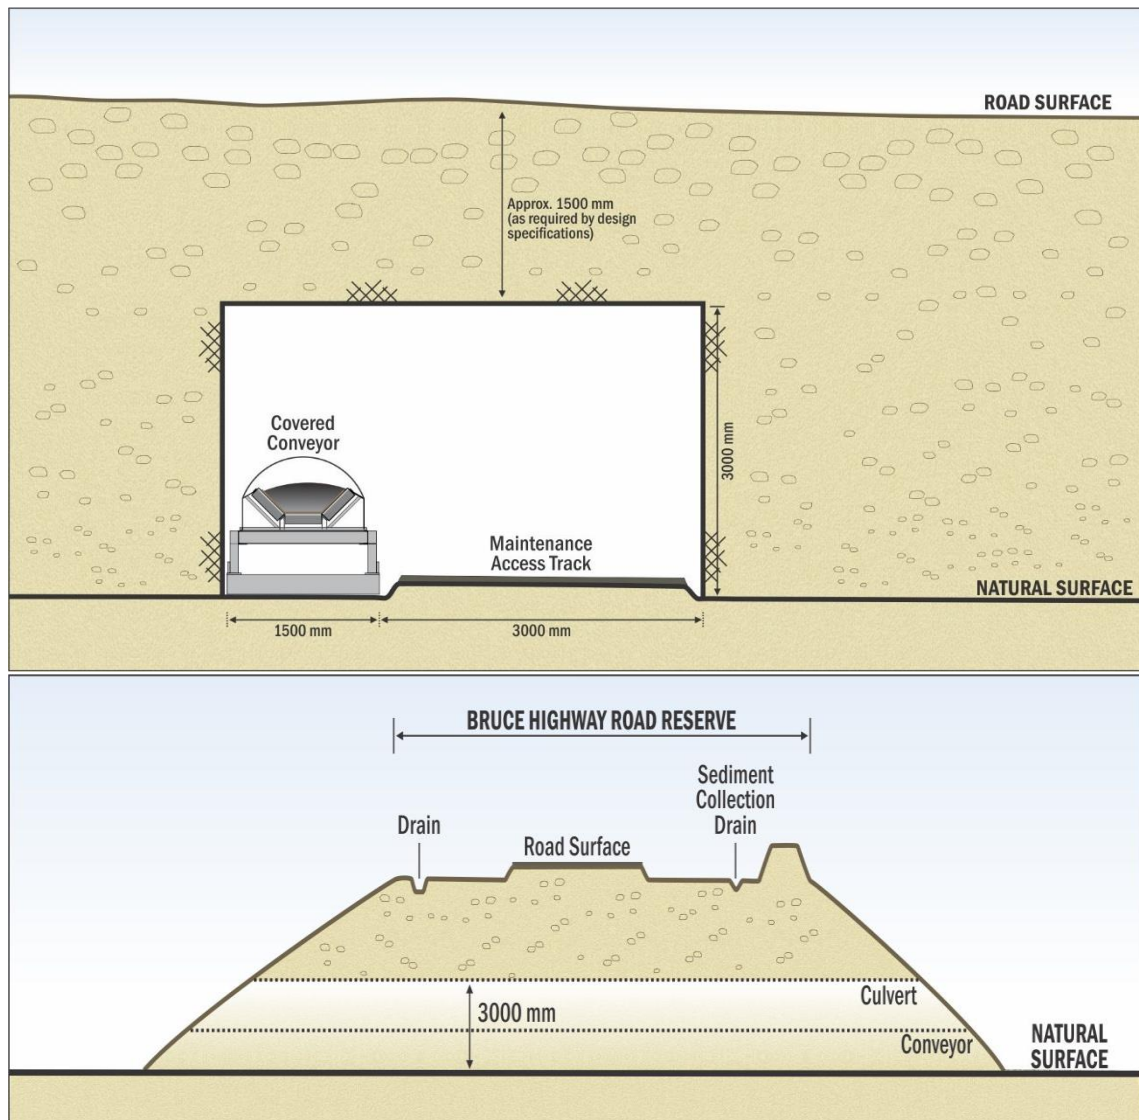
New conveyor arrangement under the Bruce Highway (from 2028 onwards)
